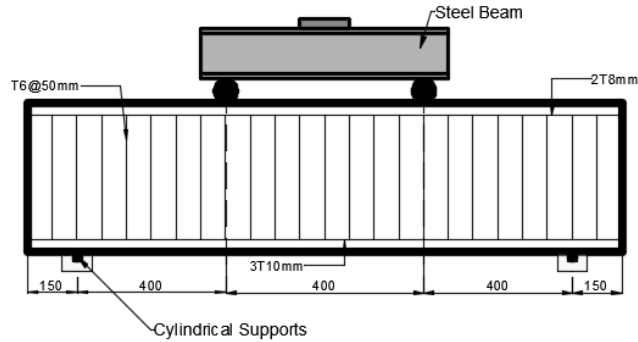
Longitudinal section of the beam with supports and loads (dimensions in mm)
